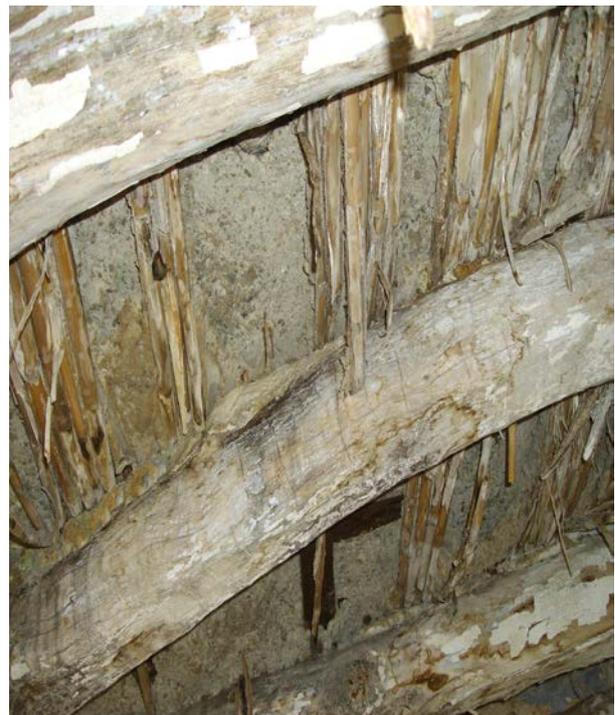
Cane bedding forming the underside of a historic gypsum plaster floor in Sierro, Andalusia, Spain.
